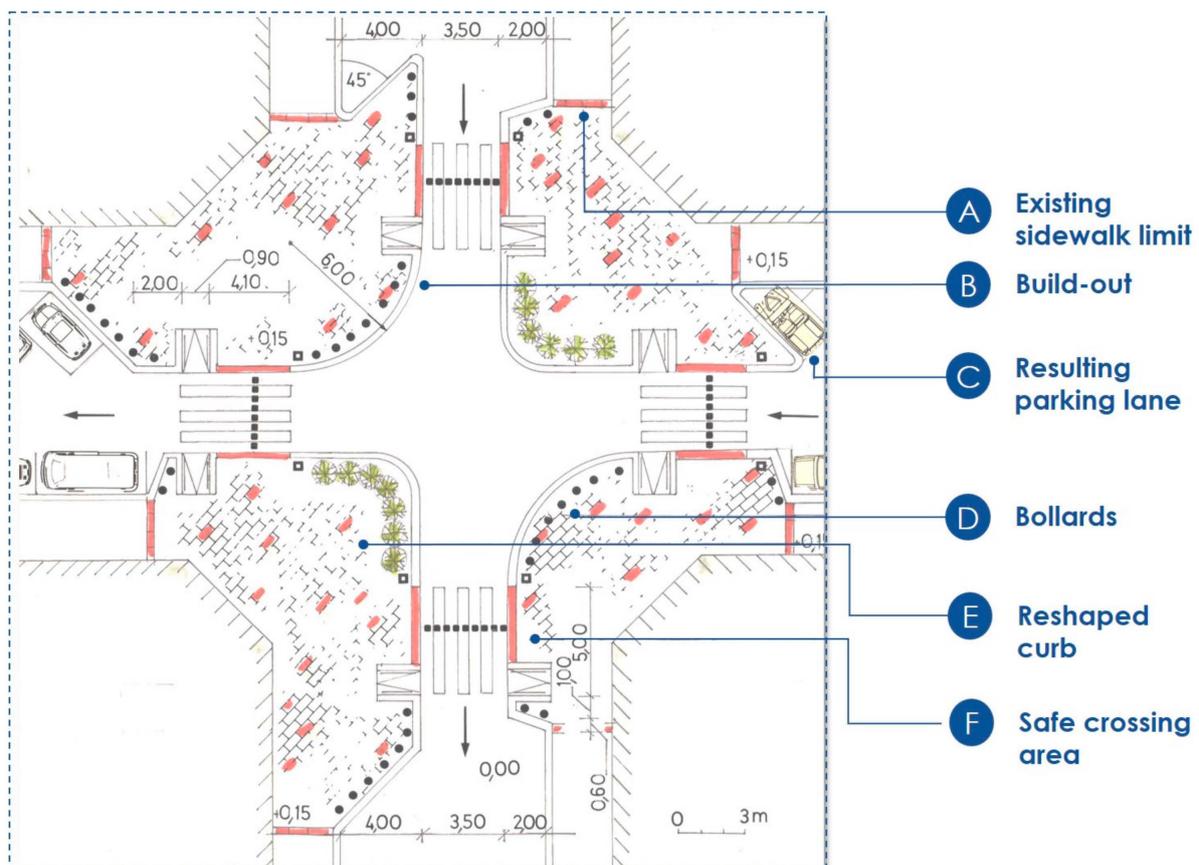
Four-arm intersection with sidewalk advancement (units in m).
